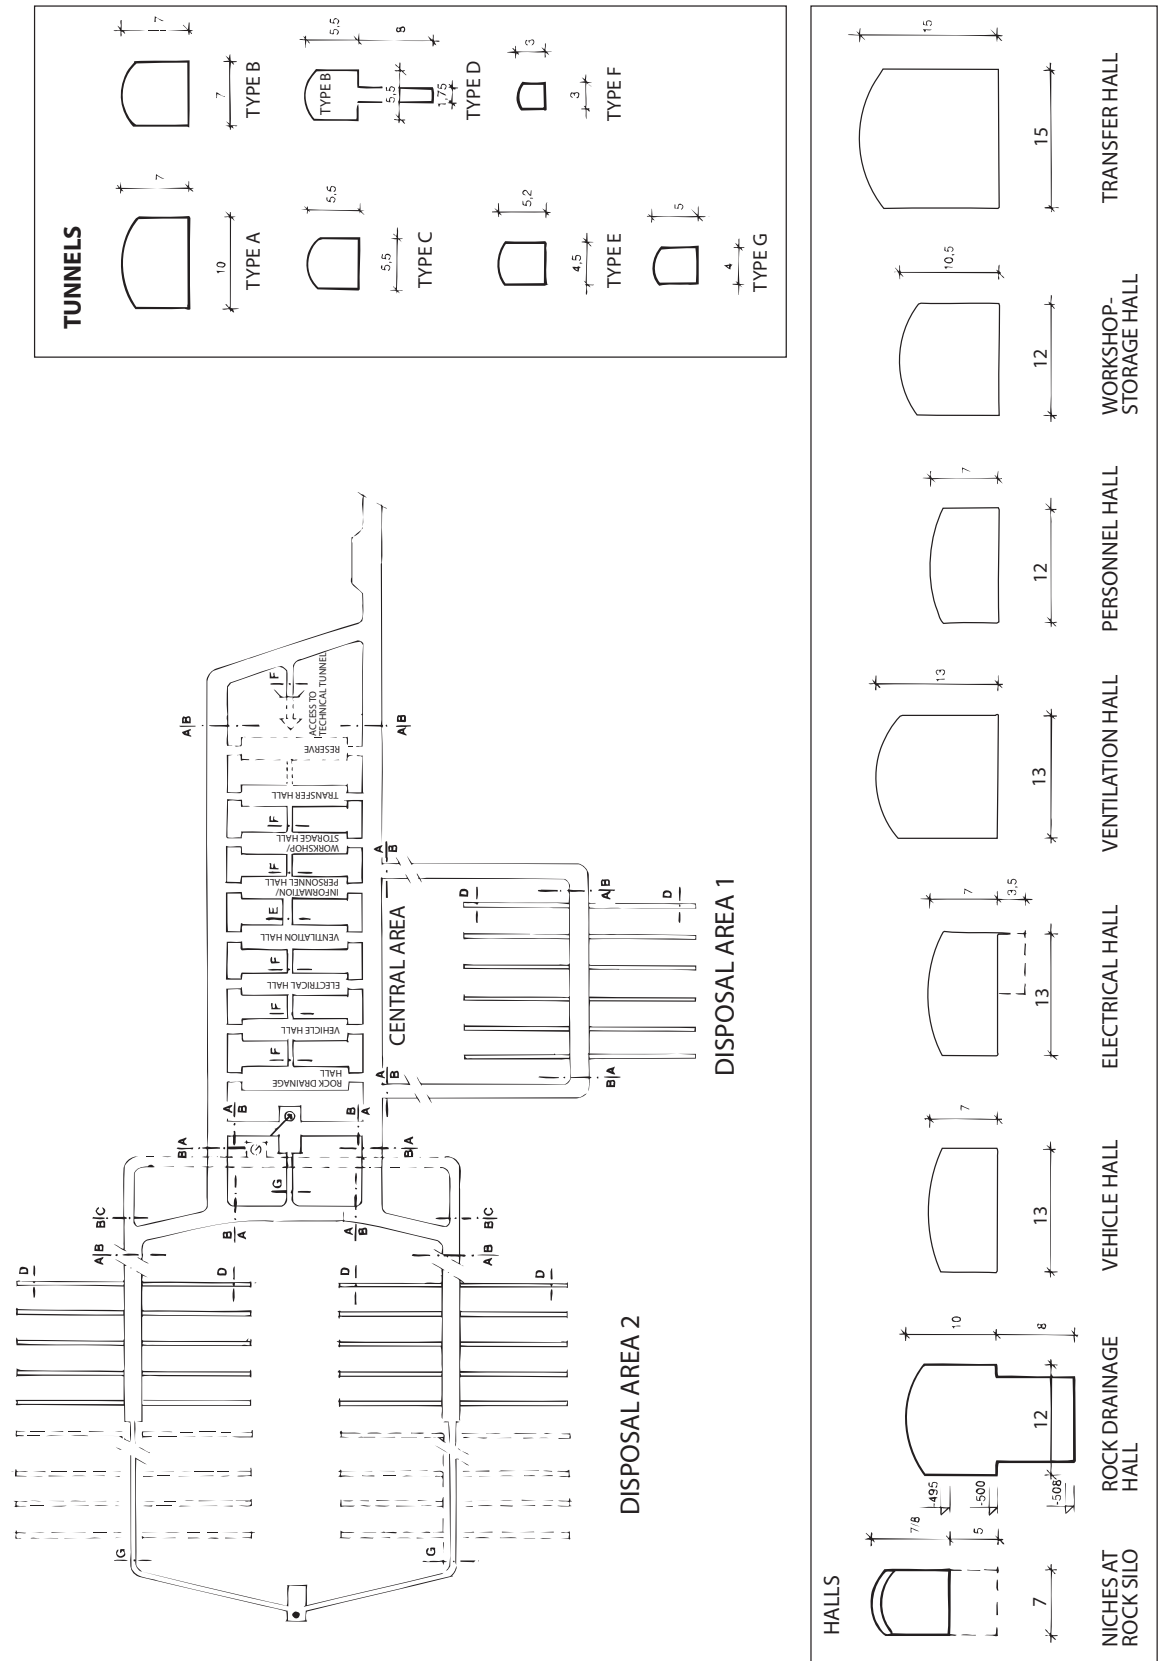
Typical tunnel profiles proposed for the KBS-3 deep repository. The actual tunnel profiles must be adapted to the local rock mechanics conditions.
